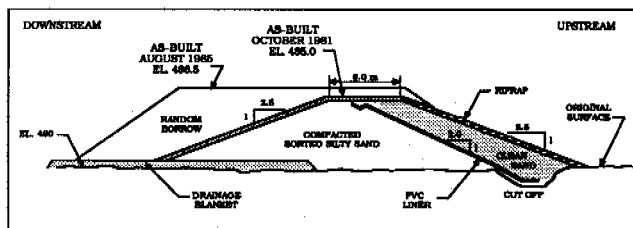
TYPICAL AS-BUILT CROSS SECTION
